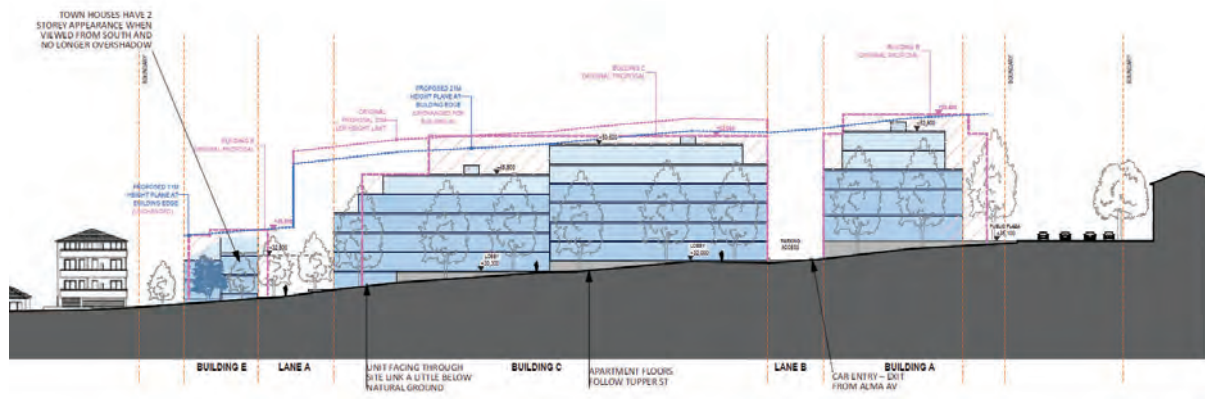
Elevation of Proposal Facing Tupper Street (in blue) - Compared to Original Proposal (in pink)
